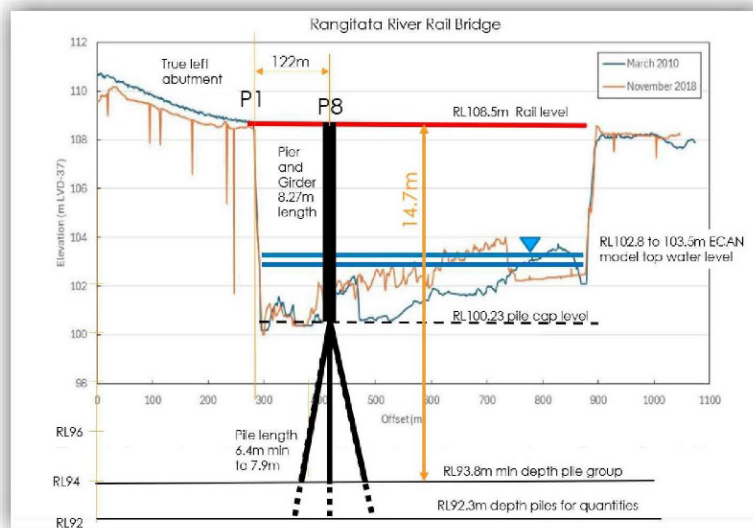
Bridge Support Structure at Pier 8 - main dimensions relevant to scour
